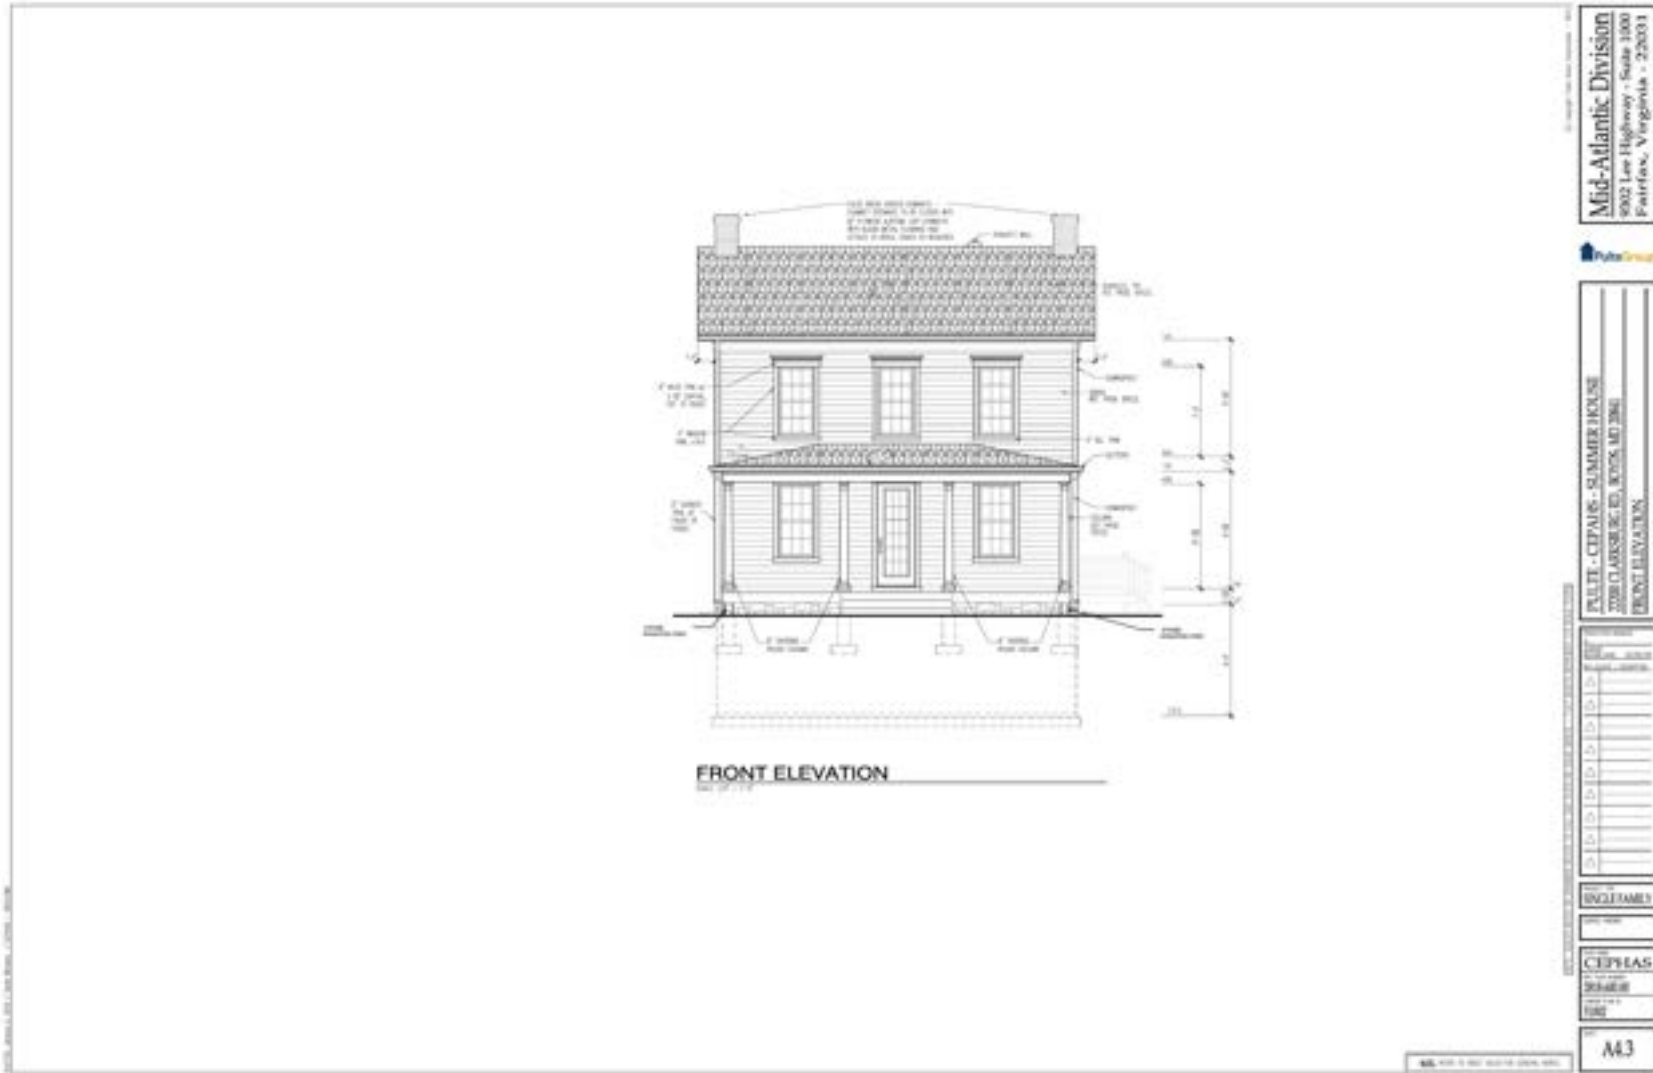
The front elevation provided as part of this submission. Changes include regrading; revisions to the locations of the chimneys; and the addition of gutters and downspouts and wrapped porch posts.
